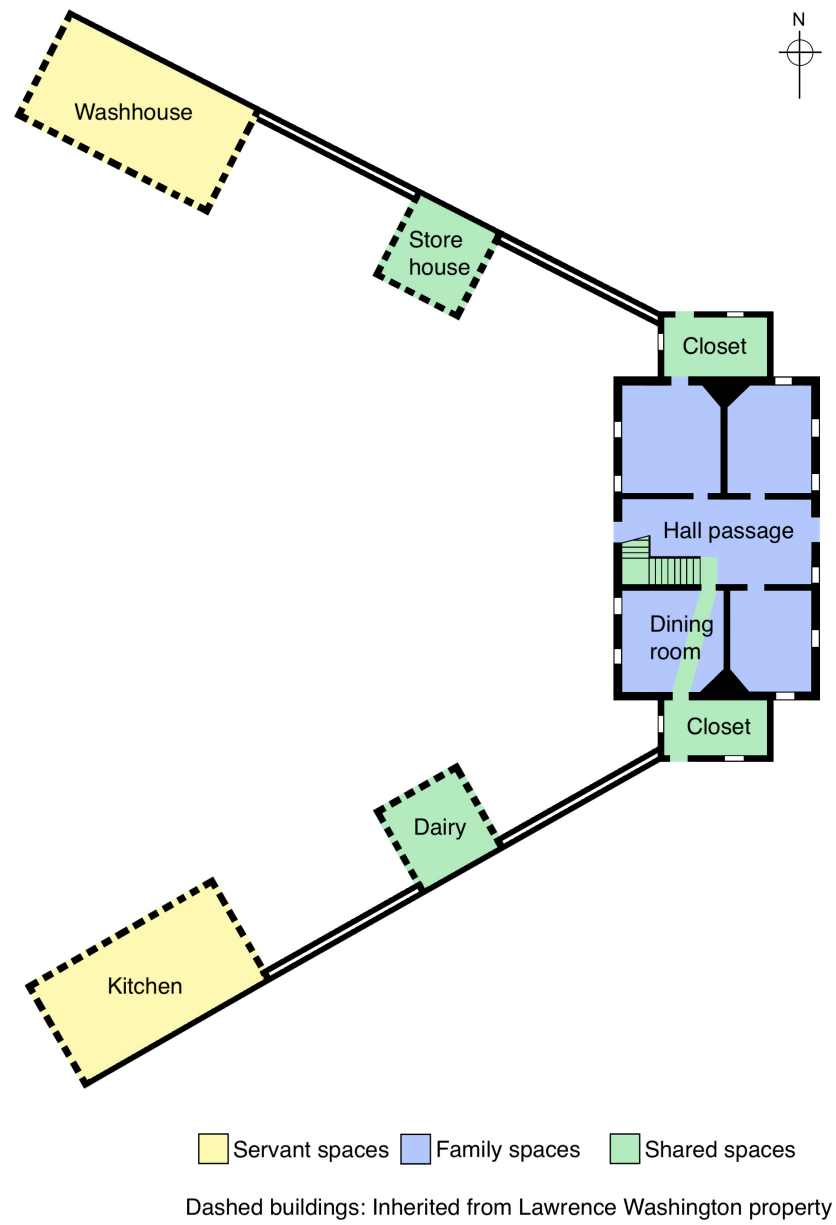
Mount Vernon c1759 Phase 1 ground floor plan
